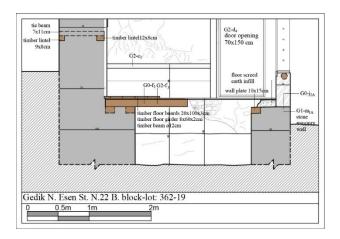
Drawing of simple flooring (Type 1) in the ground floor without basement (Gedik N. b.block-lot:362-19)
